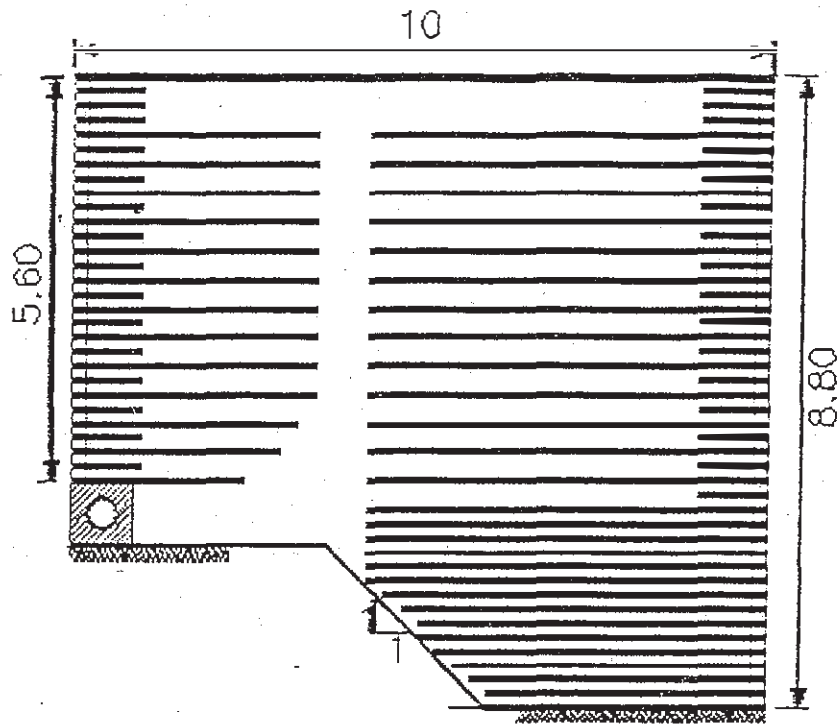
Cross section of the Nurbaba Geosynthetic Reinforced Segmental Retaining Structure
